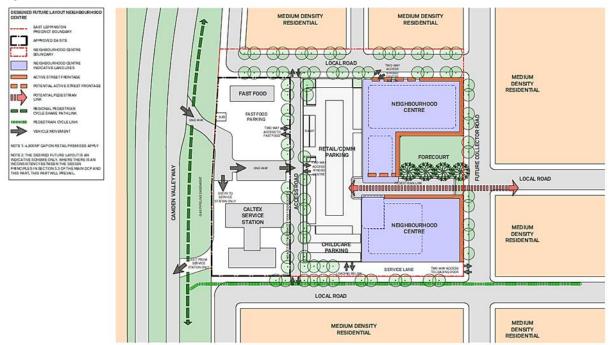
Proposed desired future layout of the Neighbourhood Centre
